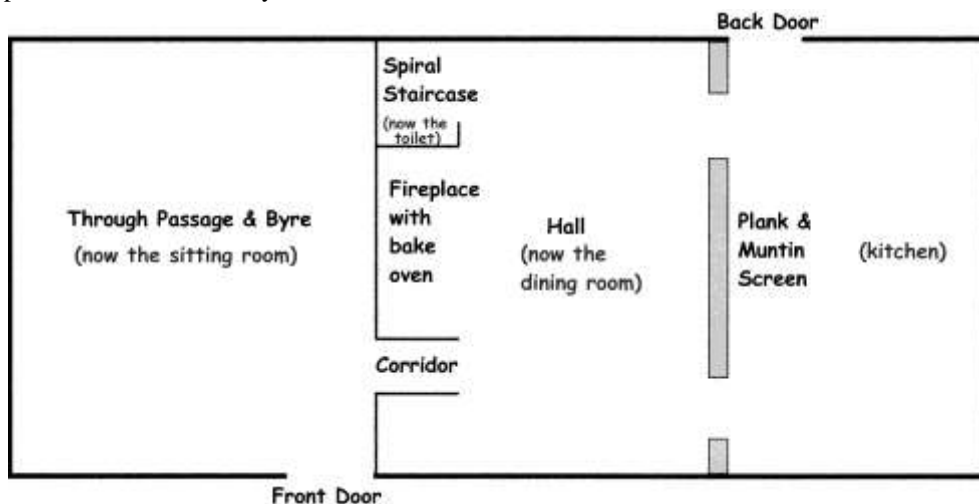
Plan of the ground floor of Mynydd Brith House (not to scale)
